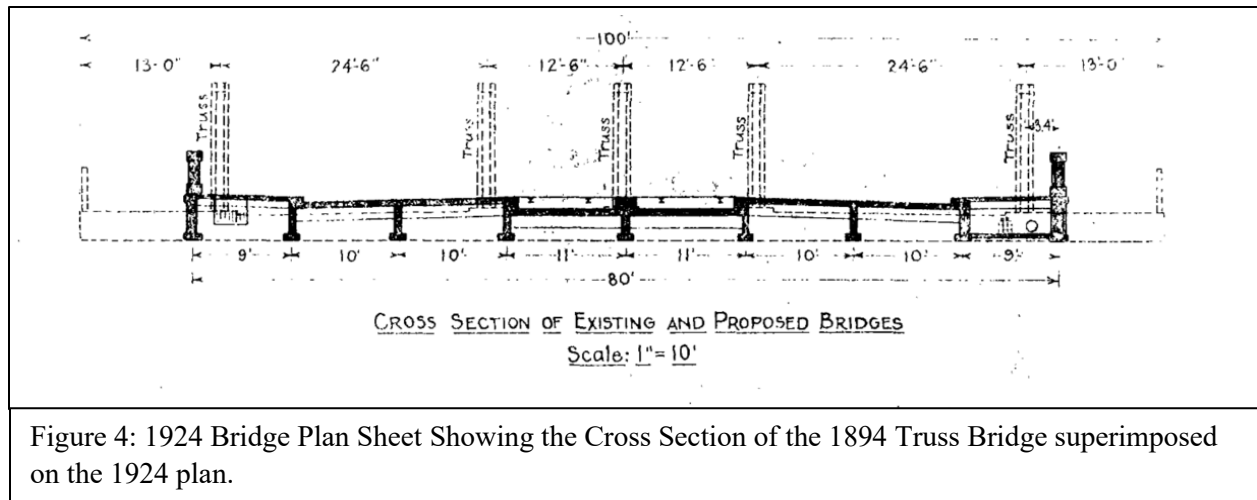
1924 Bridge Plan Sheet Showing the Cross Section of the 1894 Truss Bridge superimposed on the 1924 plan.
